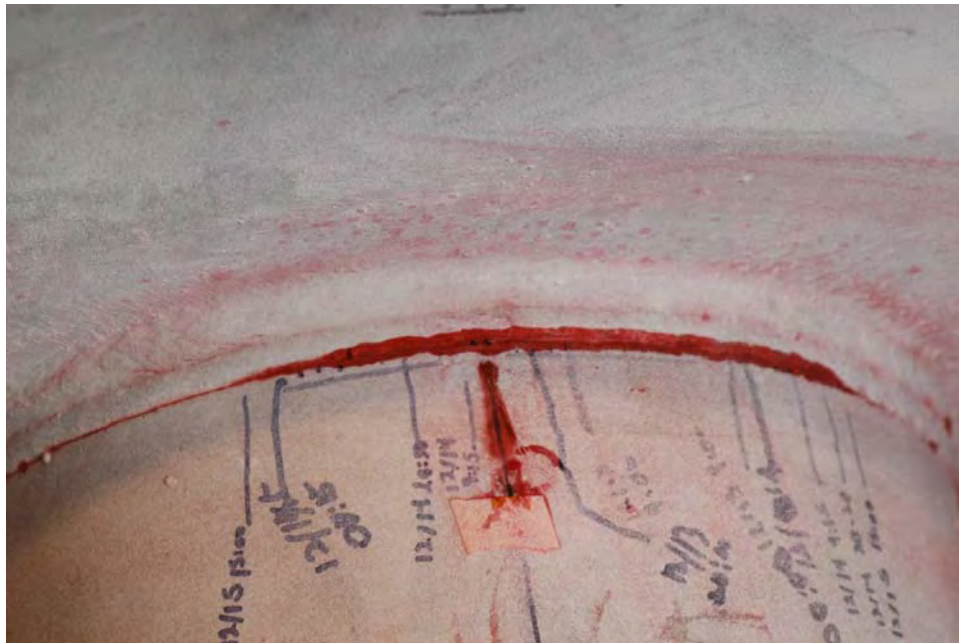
Fatigue cracking in arm from the toe of pole-to-transverse plate groove-weld
